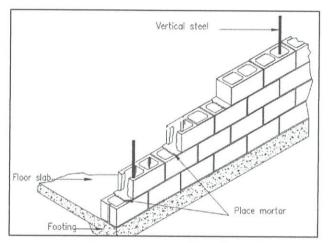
Starter Bar at Wall Stiffener (Source: Modul Pemasangan CMU Projek PPR Tanjong
